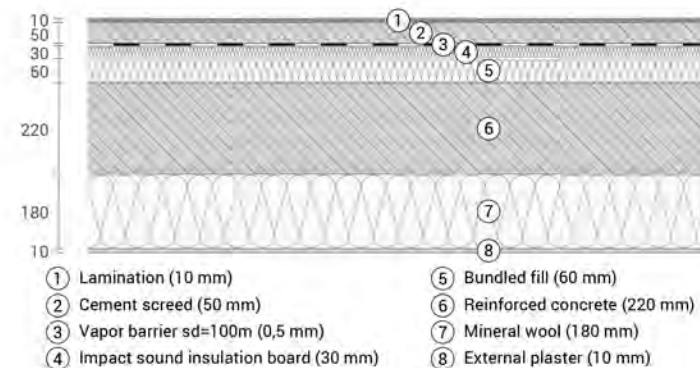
Detail of the overhang ceiling to outside air, created by the author.
